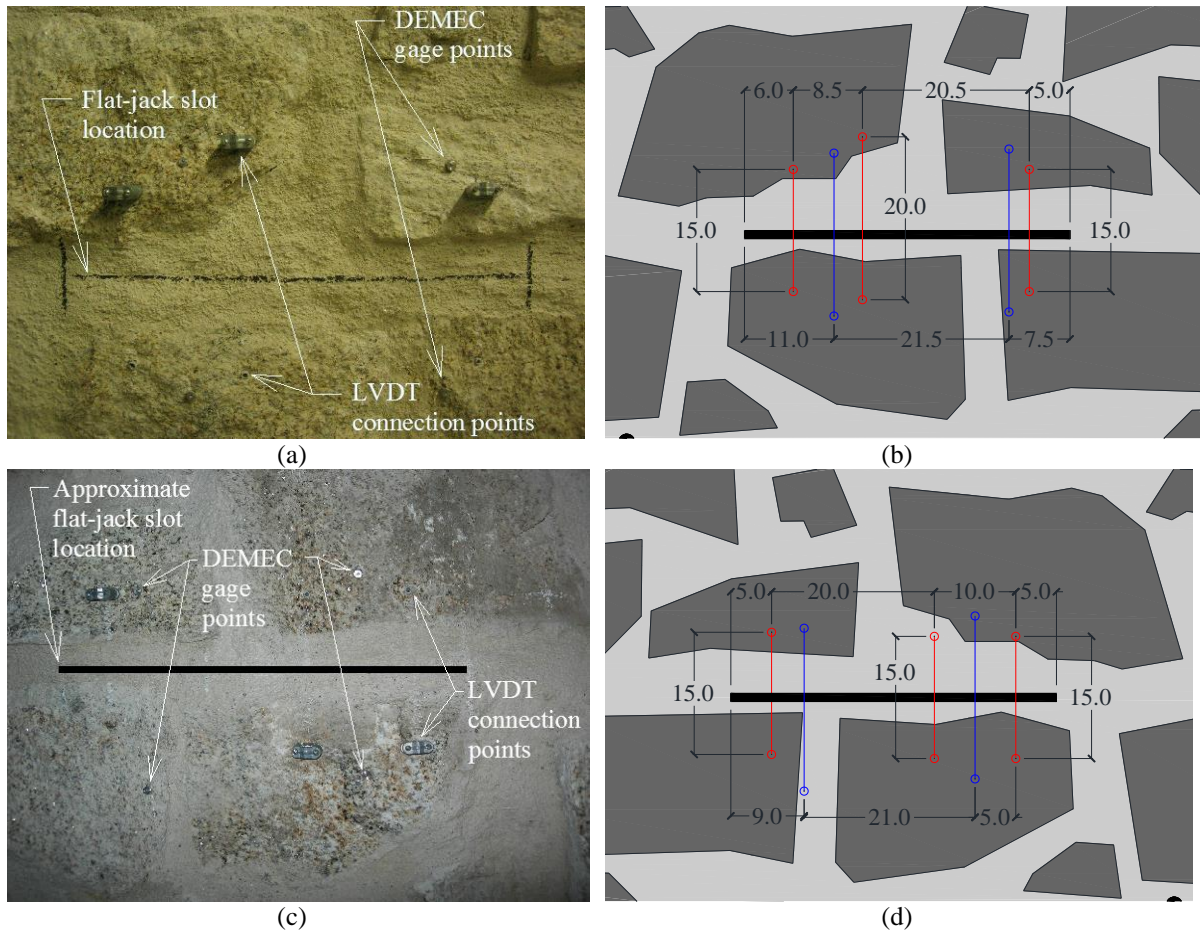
Attachment of DEMEC gage points and LVDT connection points for the single flat-jack test in the irregular wall: (a) and (b) show the front of the wall; and (c) and (d) show the back of the wall (DEMEC points in blue and LVDT points in red, dimensions in [cm])
